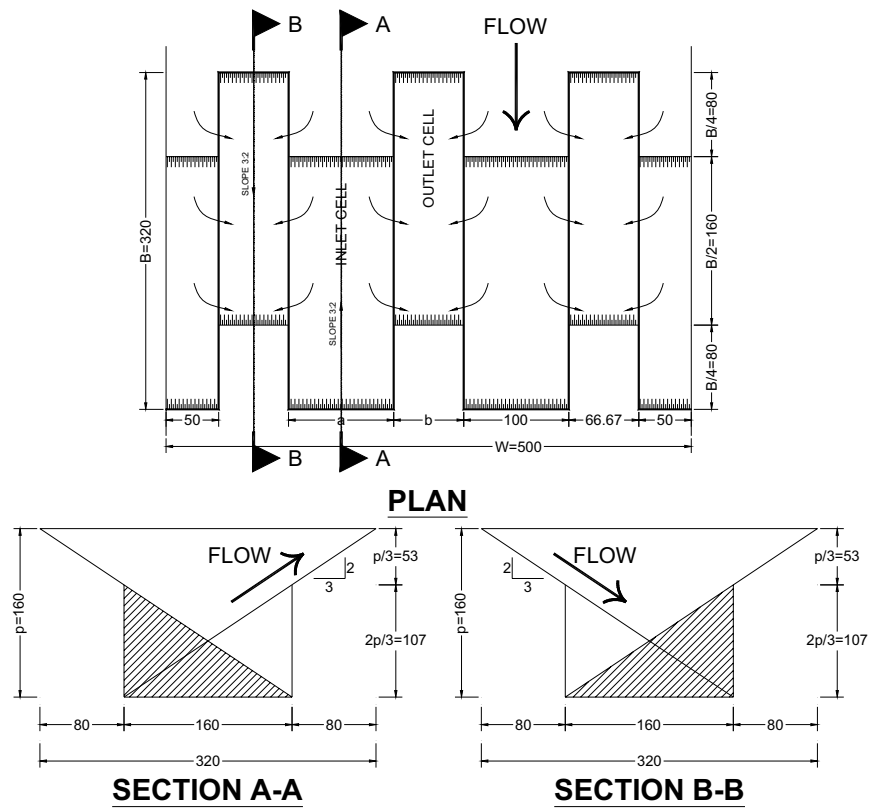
Plan and section of model P₃M₃ (both sides ramping), (dimensions in mm)
